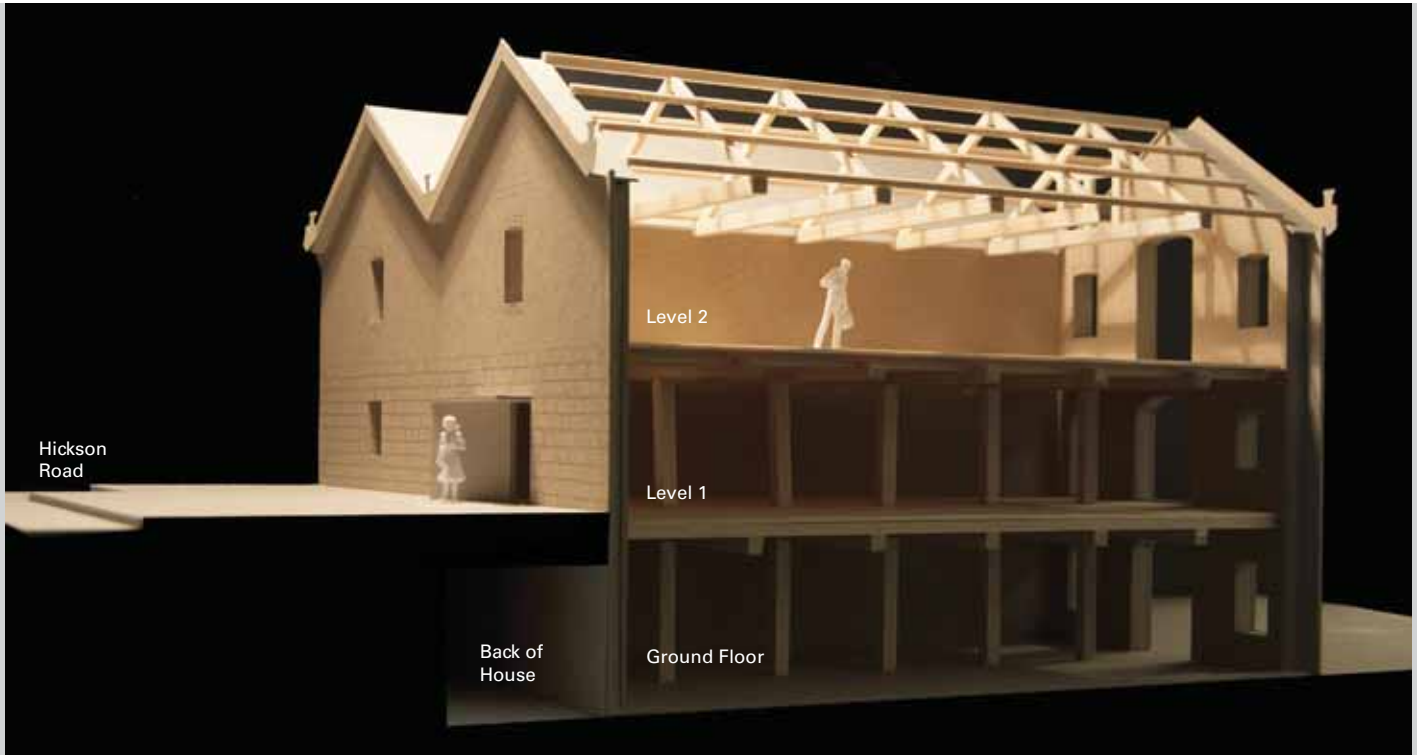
Cross-sectional model showing the 'stripped back' building
